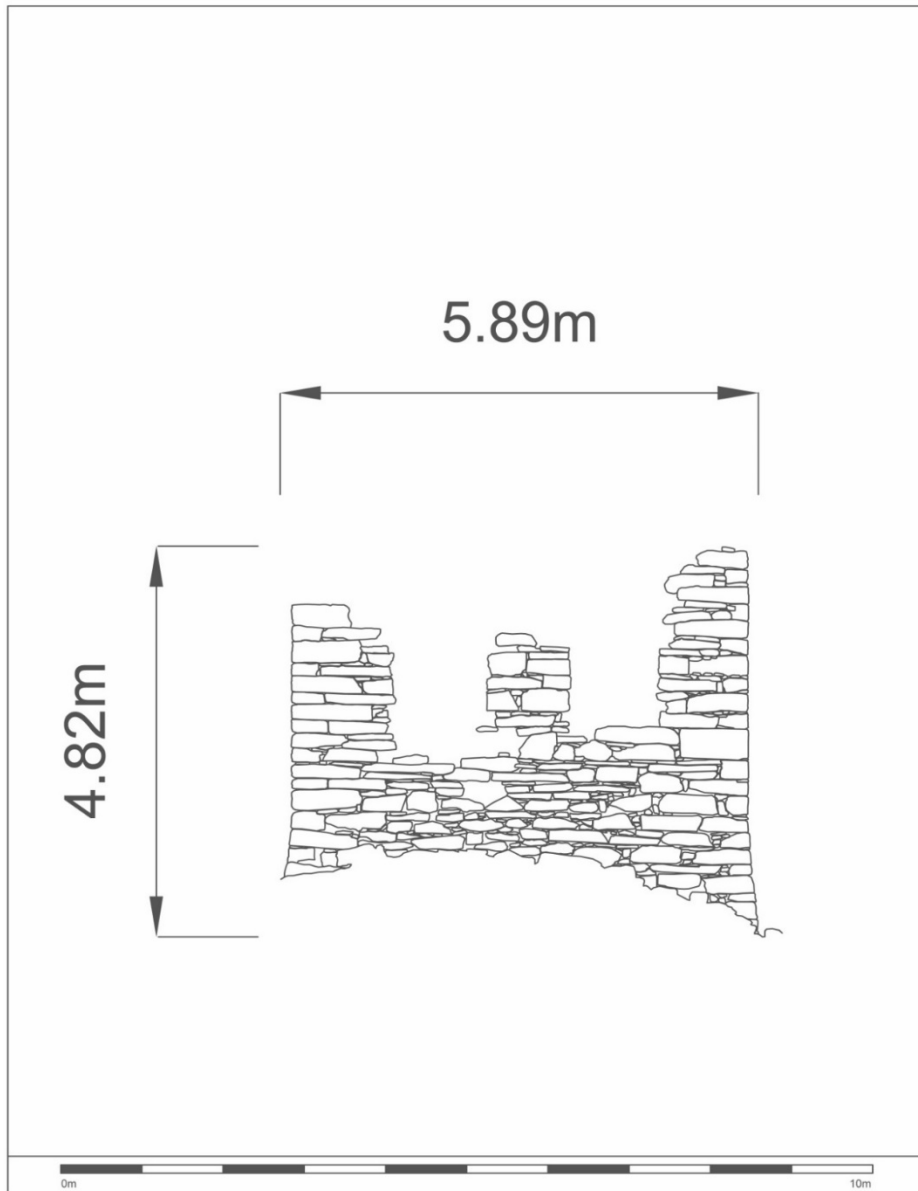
External elevation of the south wall of Saddle Hill Signal Tower.
